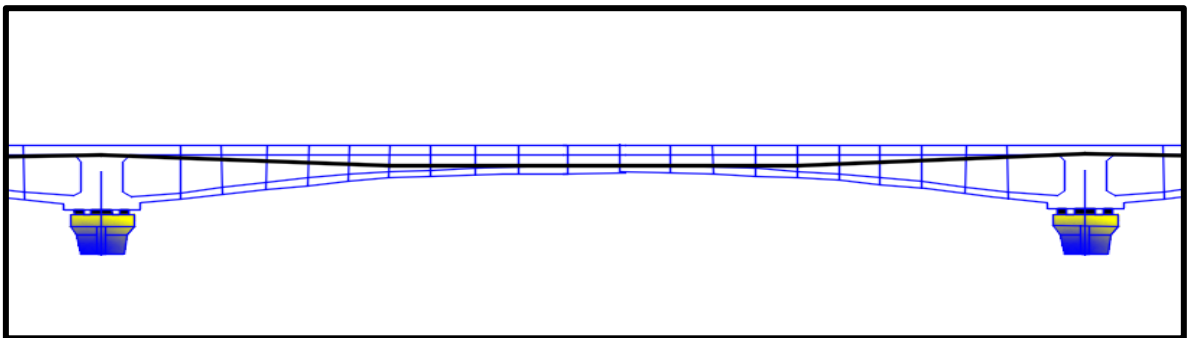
Design of External Continuity Tendons in Box-Girder Bridge
